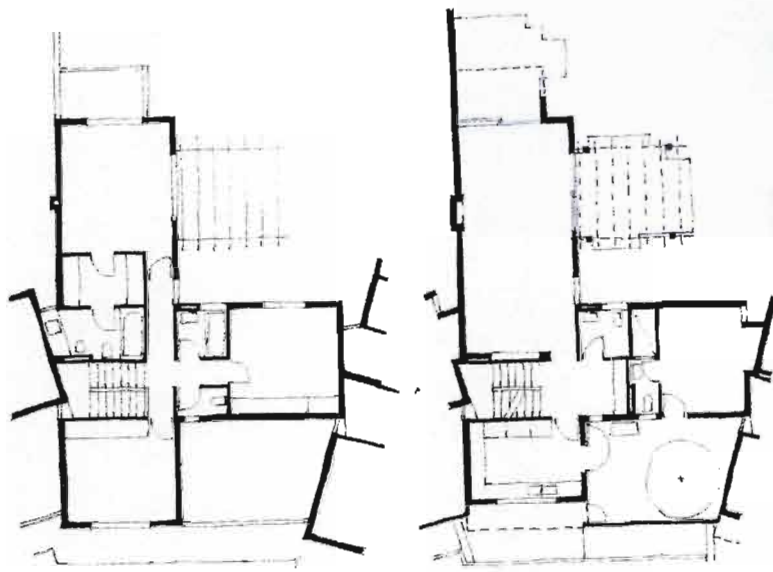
BDG – Kloof Park (1969). Scheme 1 site plan.
